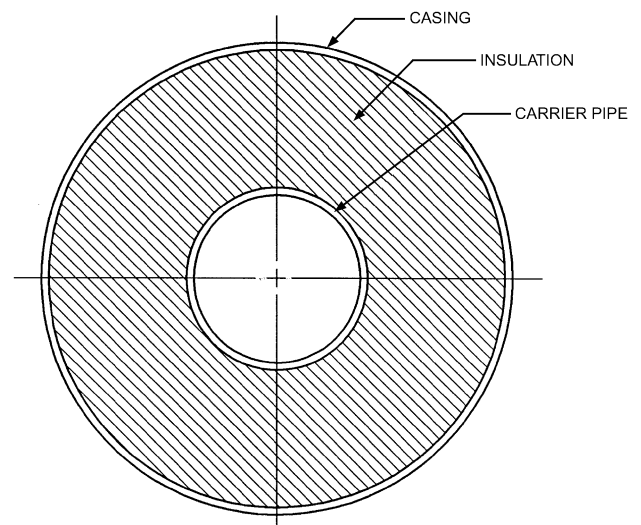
Conduit System with Single Carrier Pipe and No Air Space (WSL)
